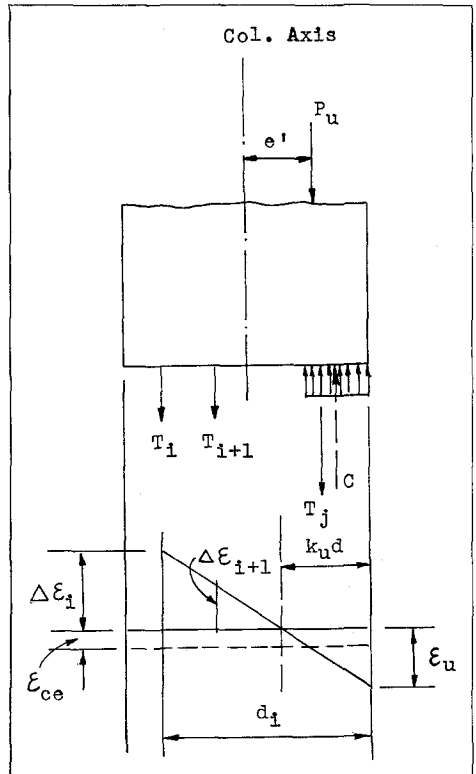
Stresses and Strains on a Typical Column Cross Section
